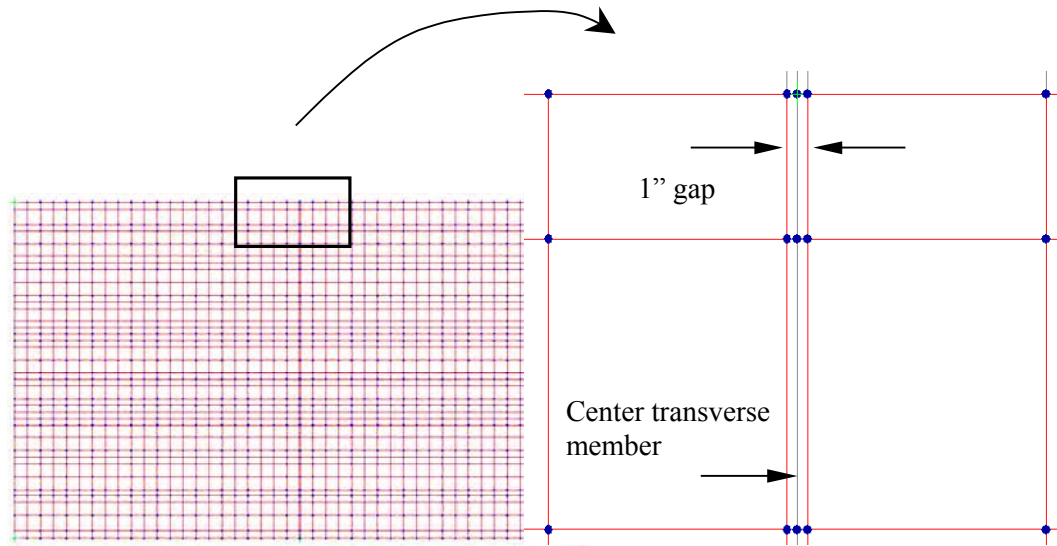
Plan view of deck model, with cut out of 1" gap in slab
